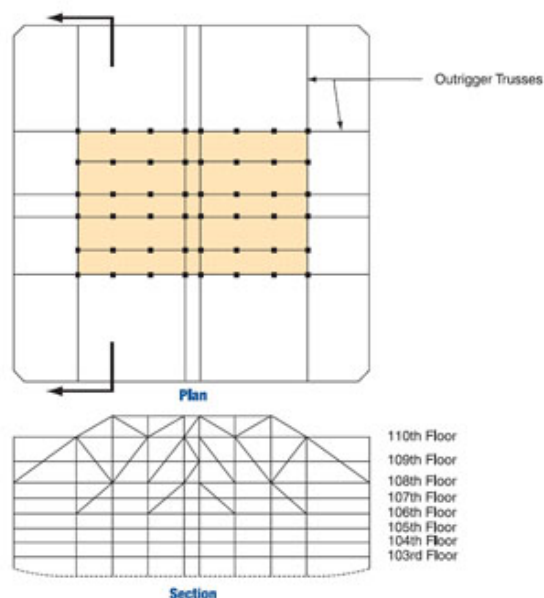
The configuration of the hat trusses of the World Trade Centre
